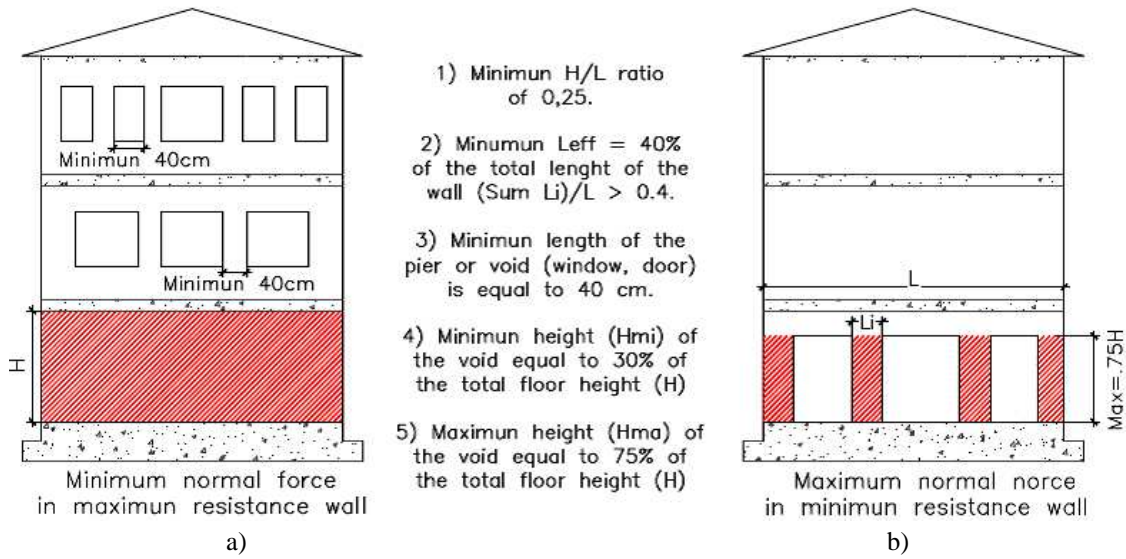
a) Maximum wall lateral resistance at the 1st storey, b) minimum possible capacity at the 1st story in case of diagonal shear failure mode and poor material properties in a 3 storey building
